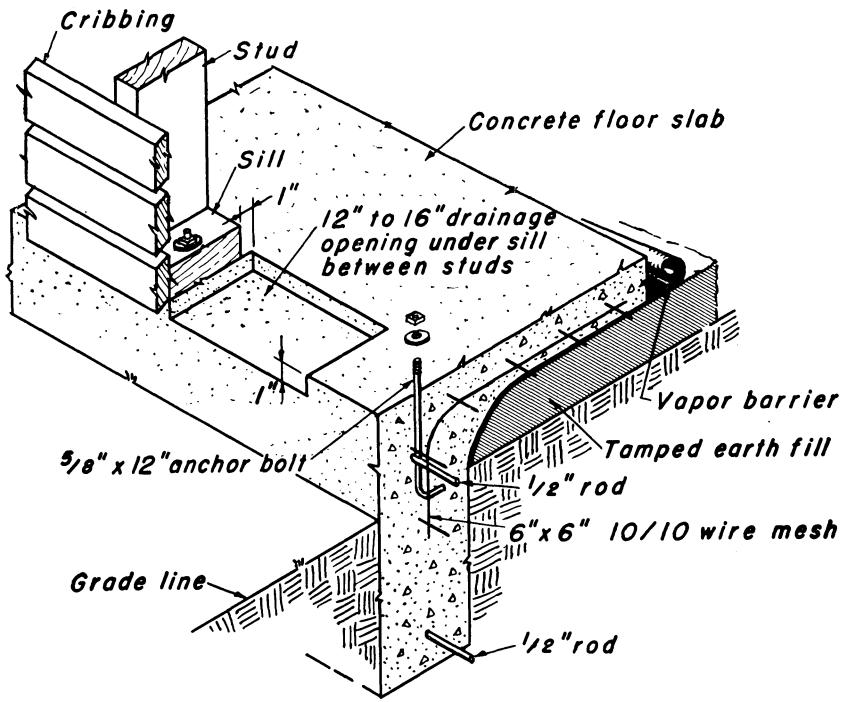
Construction details of a concrete floor for a corncrib. Note anchor bolts, drainage openings under the sill between each pair of studs, and the composition roofing placed below the floor for a vapor barrier.
